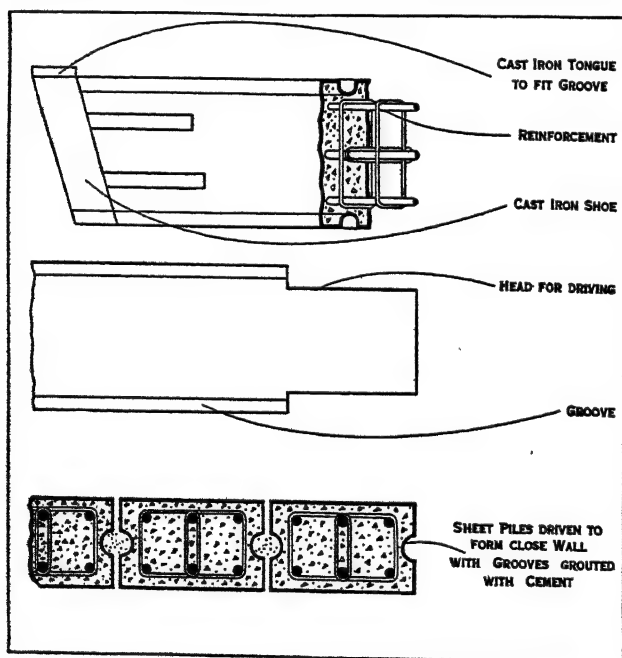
REINFORCED CONCRETE SHEET PILING
